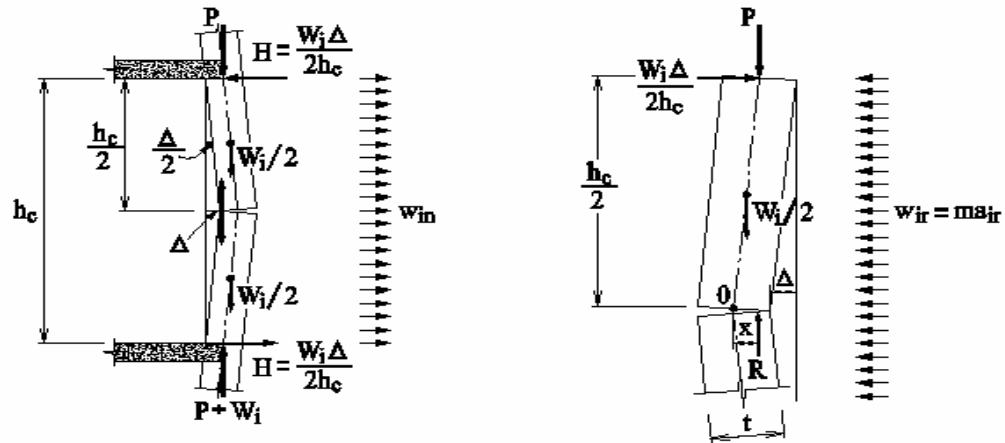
Performance of URM walls subjected to out-of-plane load.
